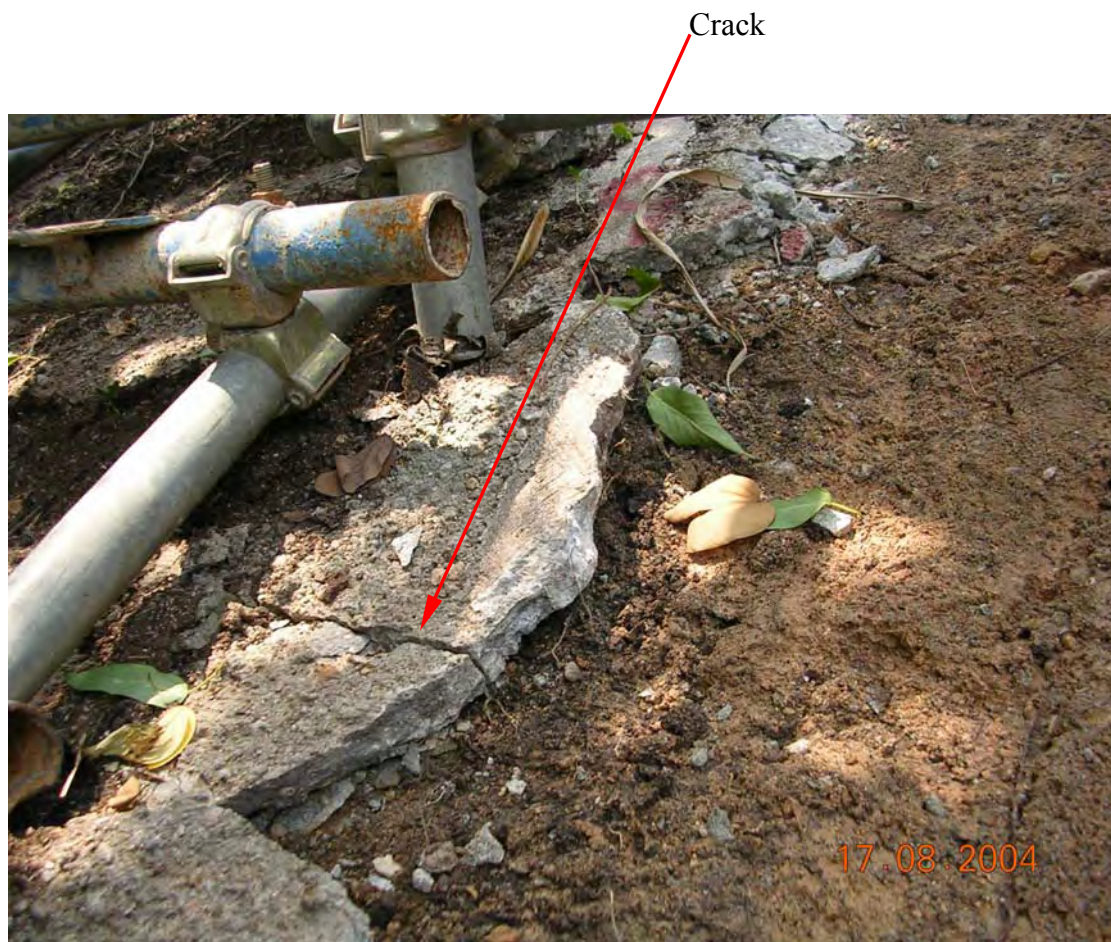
Example of Surface Strip (CS1) across Cracking in Shotcrete
